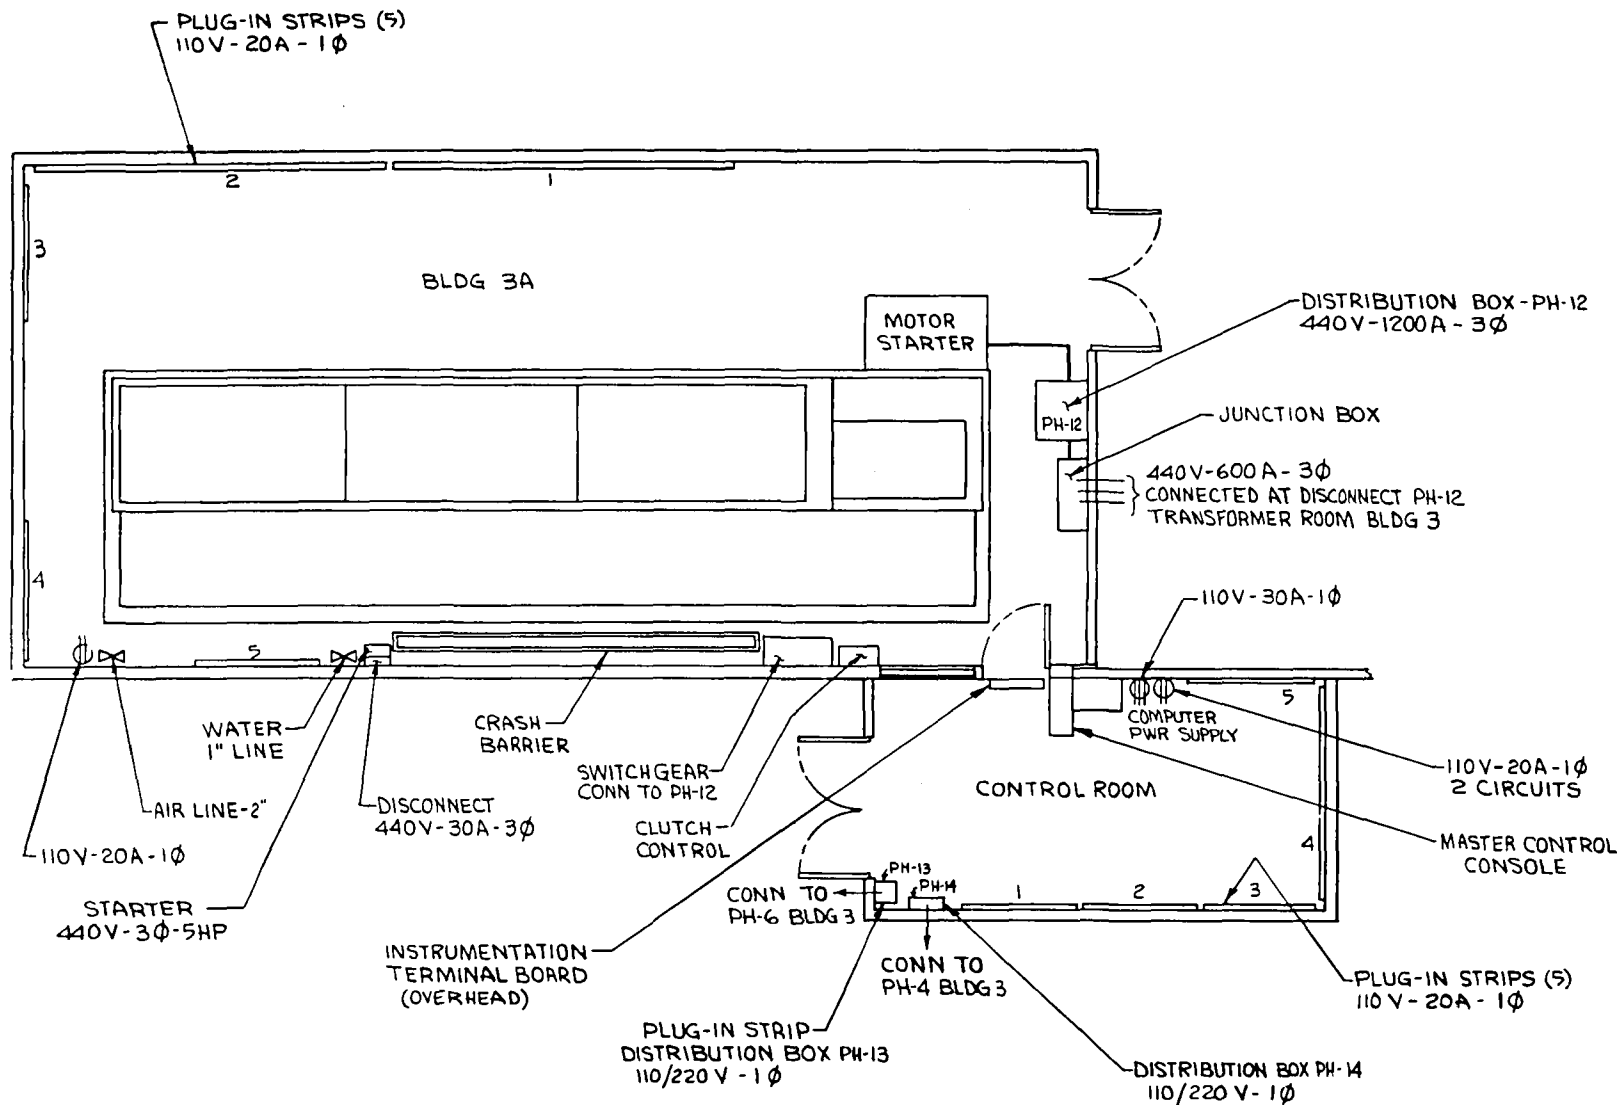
Layout of Test Rig Enclosure for Supercritical Shaft Test Rig
